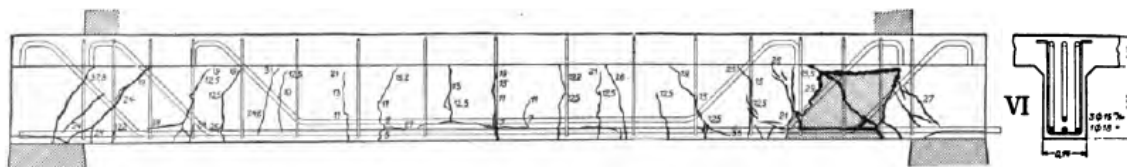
Beam VI, breaking load 37.8 t. (41.5 tons).
